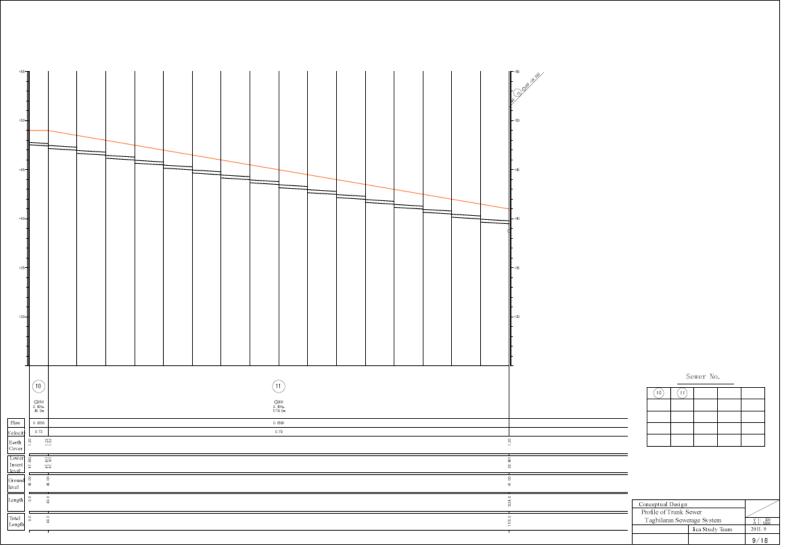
Profile of Trunk Sewer (Tagbilaran Sewerage System)
